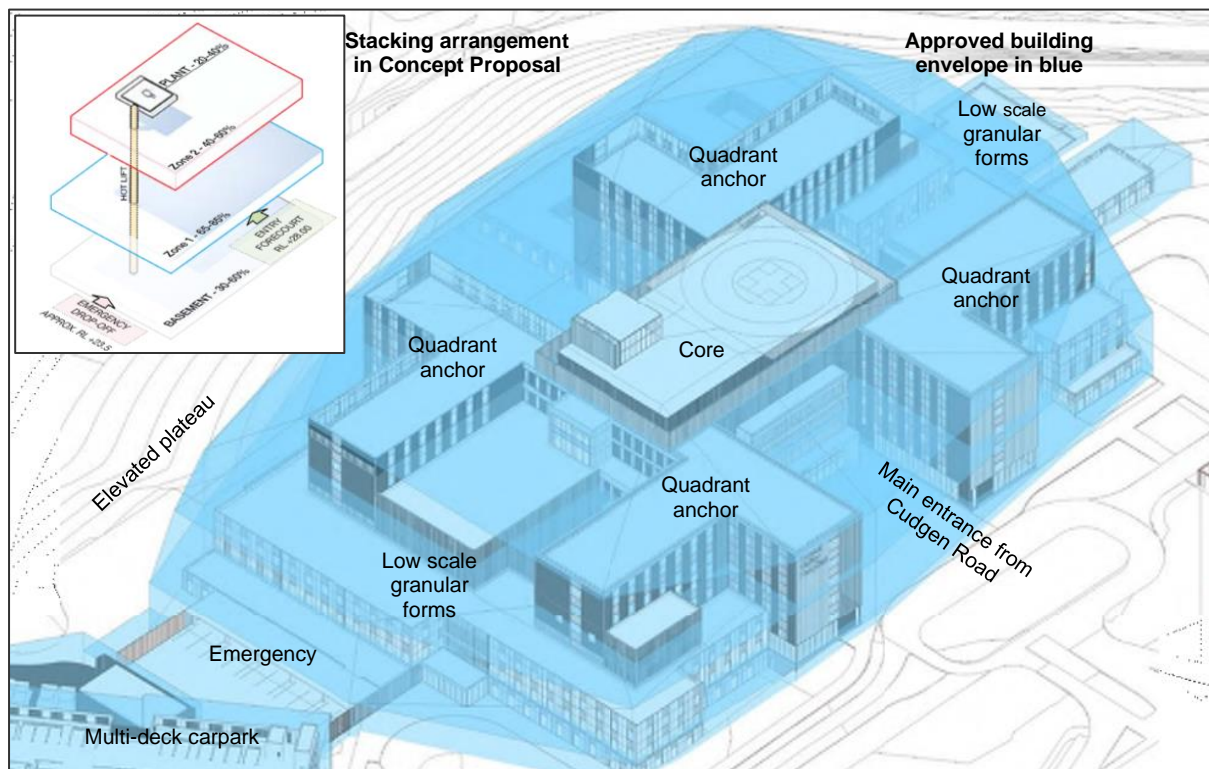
| Isometric view of the new hospital building indicating key elements and comparison with the stacking arrangement in the TVH Concept Proposal (Source: Applicant's EIS)
